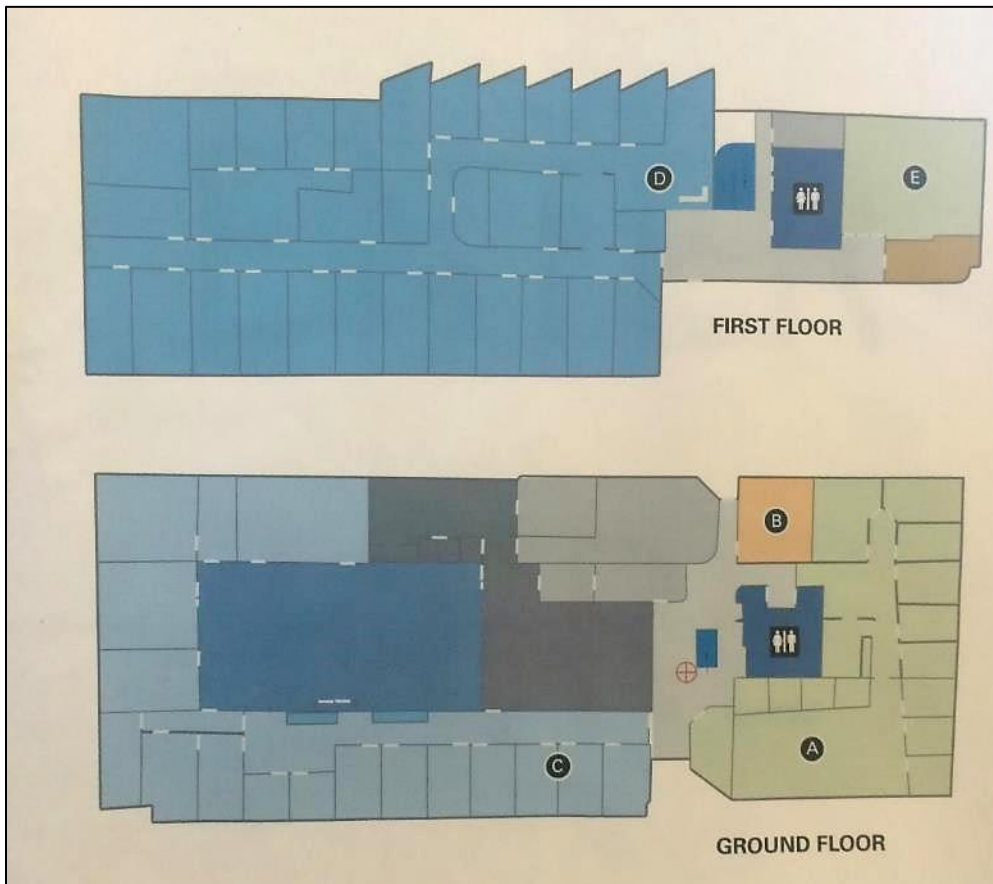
Left, diagrammatic floor plans show the layout of office, and small infill offices in the larger Commons room at the northeast corner (lower plan, lower left).
